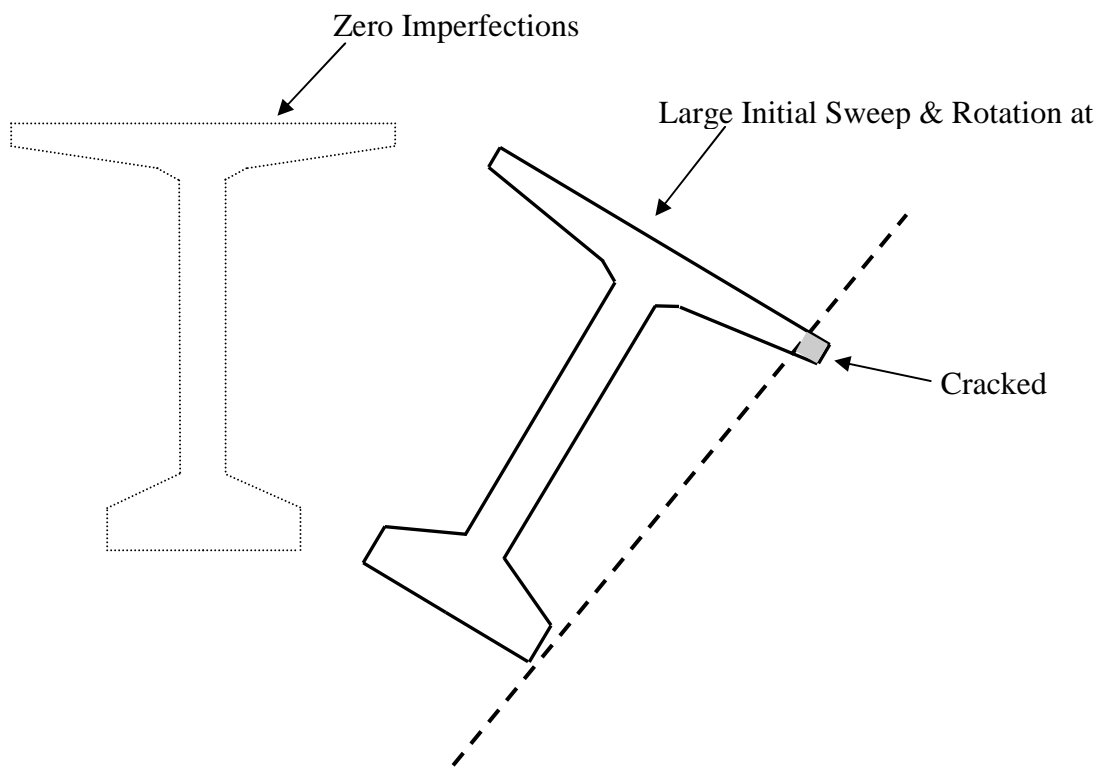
Top flange cracking due to excessive initial imperfections
